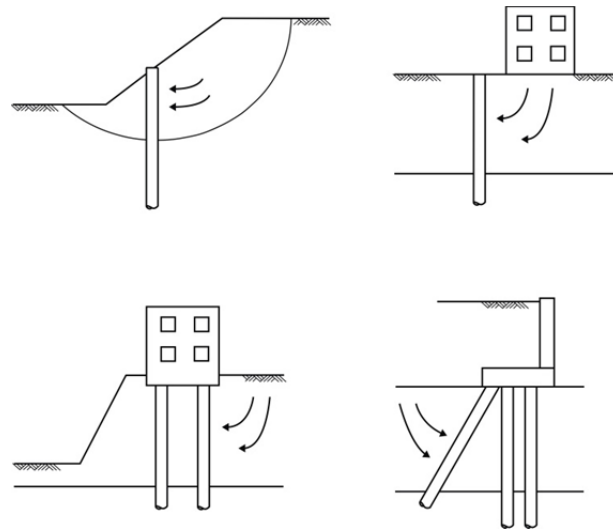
Design situations for piles stressed by lateral soil movements: a) piled slopes (dowels), b) heavy surcharge loads, c) excavations, d) piled bridge abutments with inclined piles.
